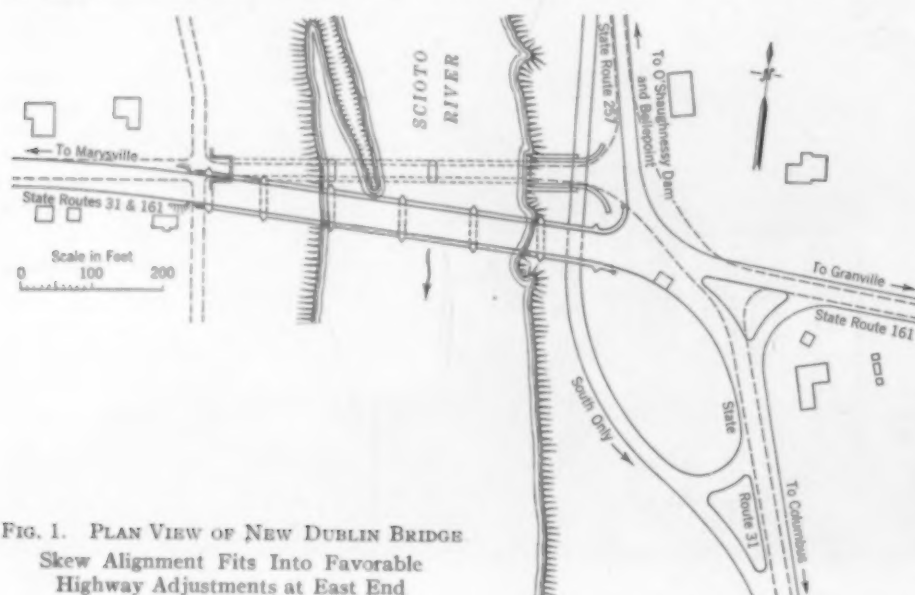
PLAN VIEW OF NEW DUBLIN BRIDGE
